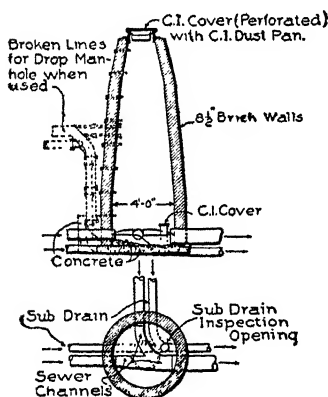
Sectional Elevation and Plan of Sewer Manhole.
